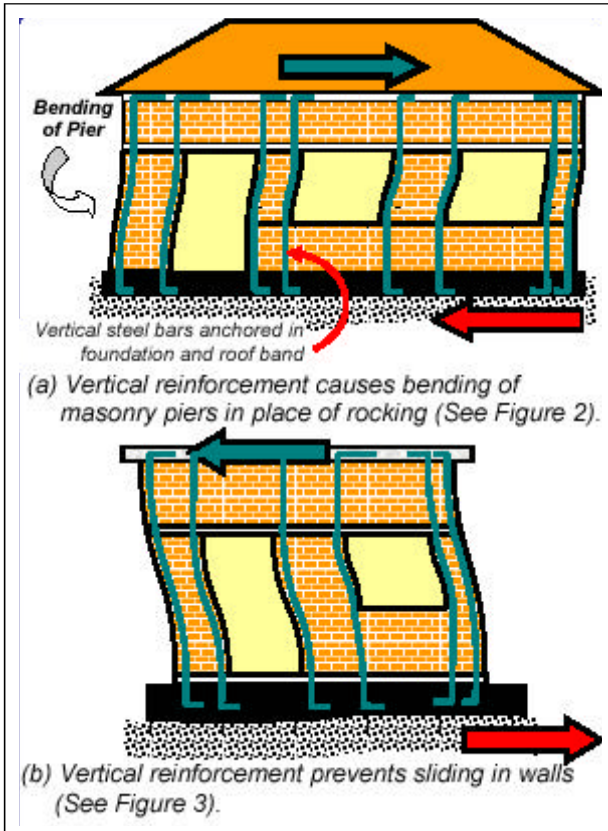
Vertical reinforcement in masonry walls – wall behaviour is modified.
